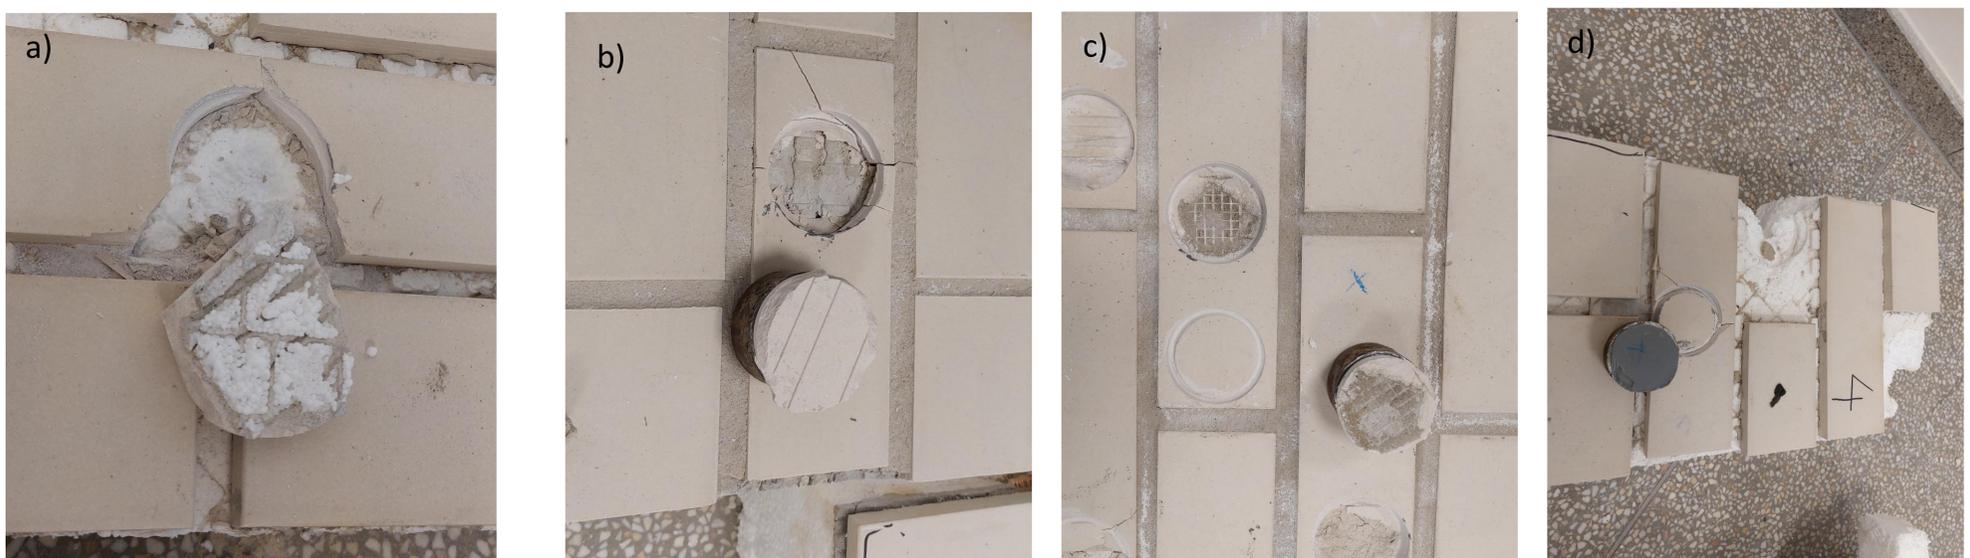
The view of: a) cohesive failure model in the insulation, b) adhesive failure model between the cladding and the glue, c) cohesive failure model inside the glued layer, d) adhesive failure between the steel disc and the cladding
